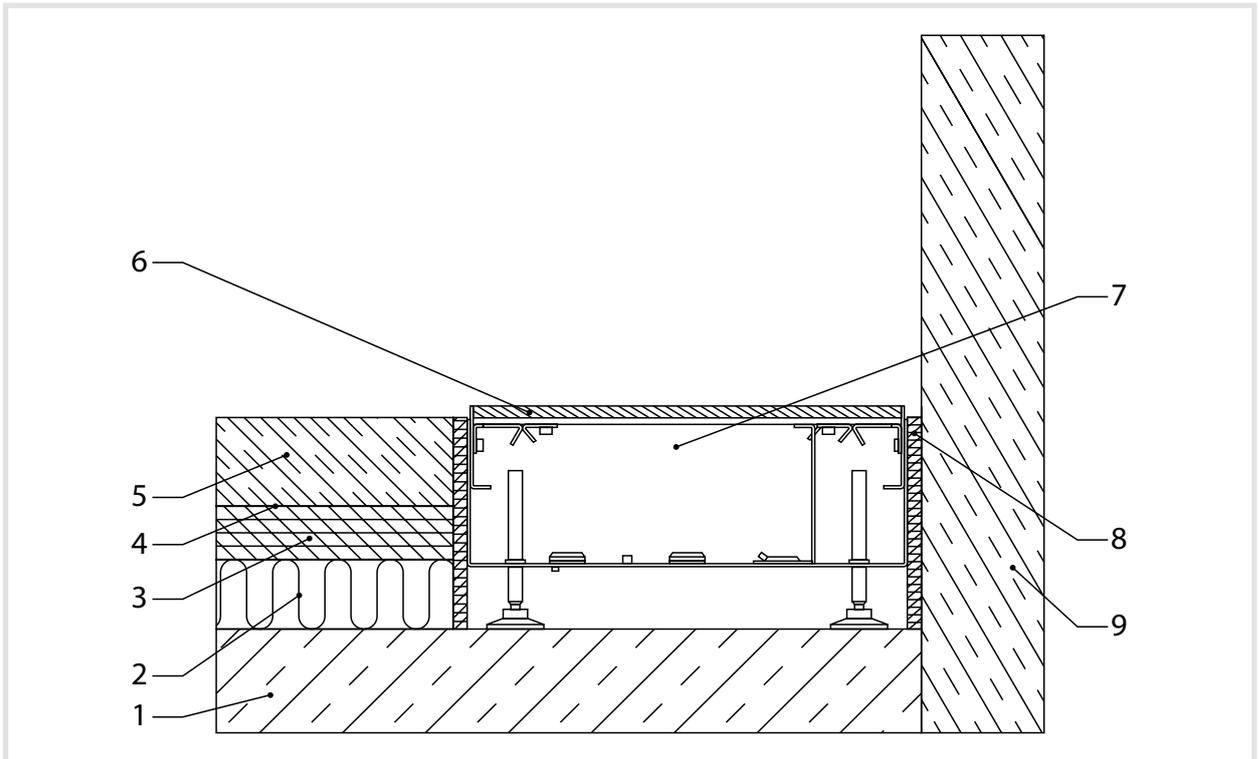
Concept drawing of the floor channel BKB25085 test setup in the ceiling test station
